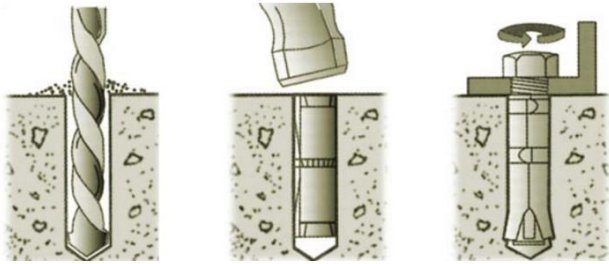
Drill holes, set Anchors, and tighten Assembly Bolts
